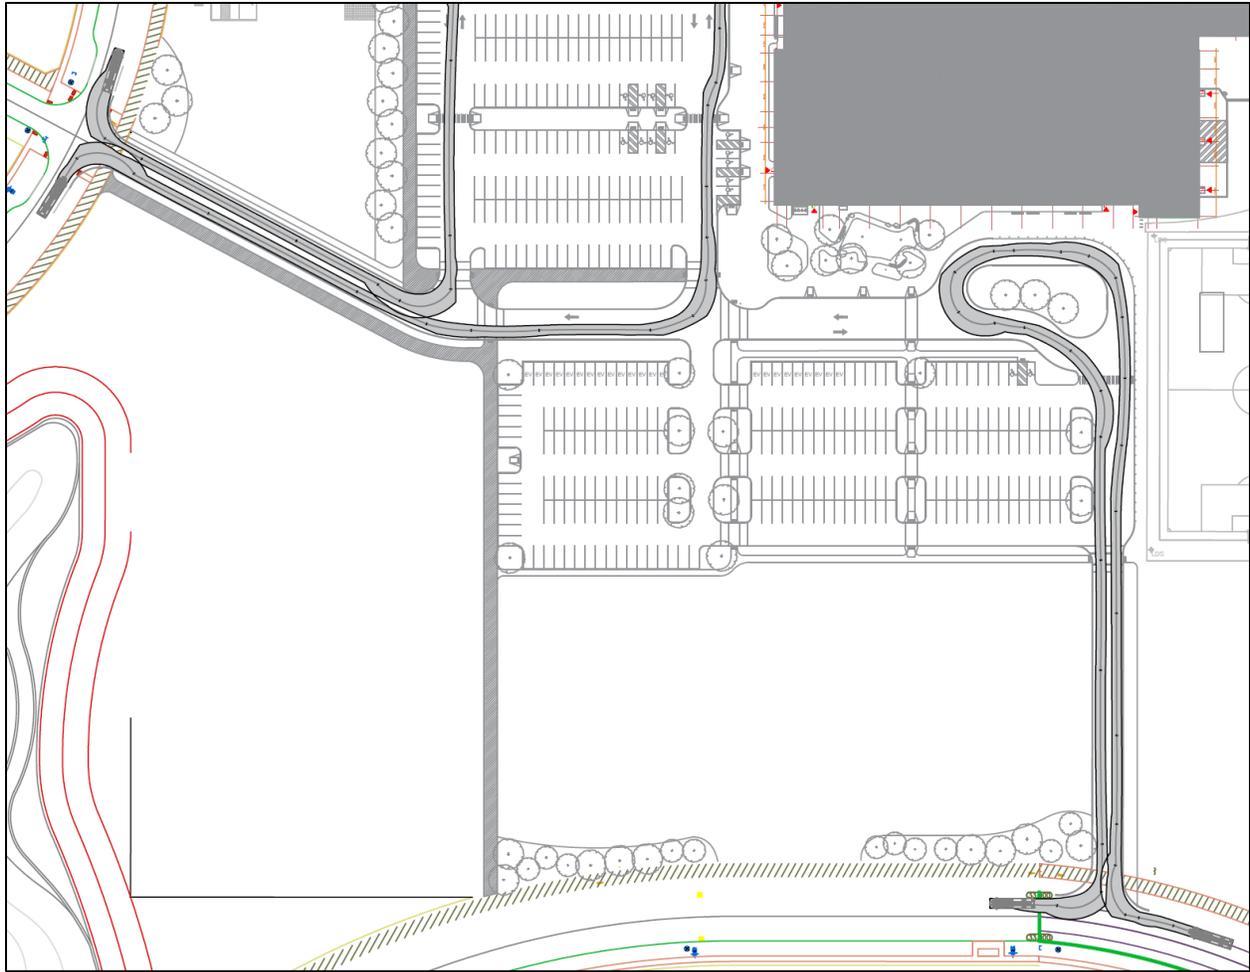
AERIAL FIRE TRUCK AUTOTURN
